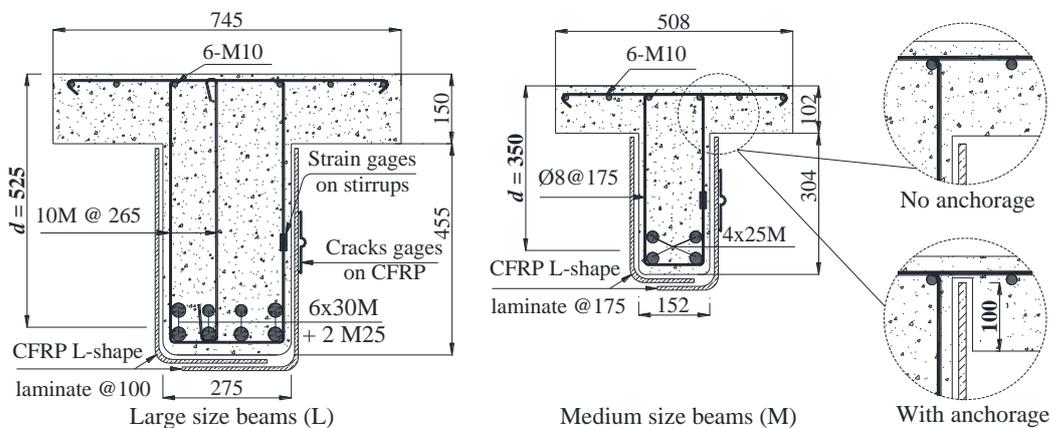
Cross section of specimen's and strengthening system (dimensions in mm).
